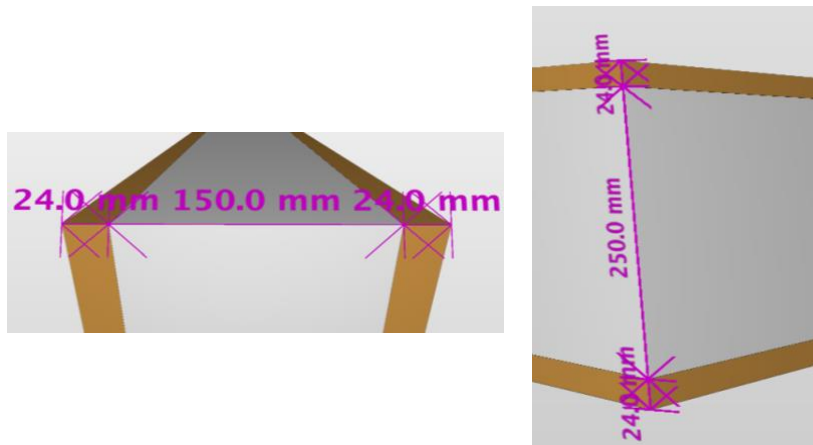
cross section of SIPs, on the right for wall sections, and on the left for ground and roof sections
